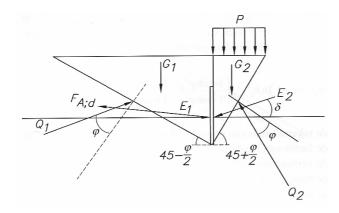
Stability of the anchor wall, with no terrain load at the passive side
